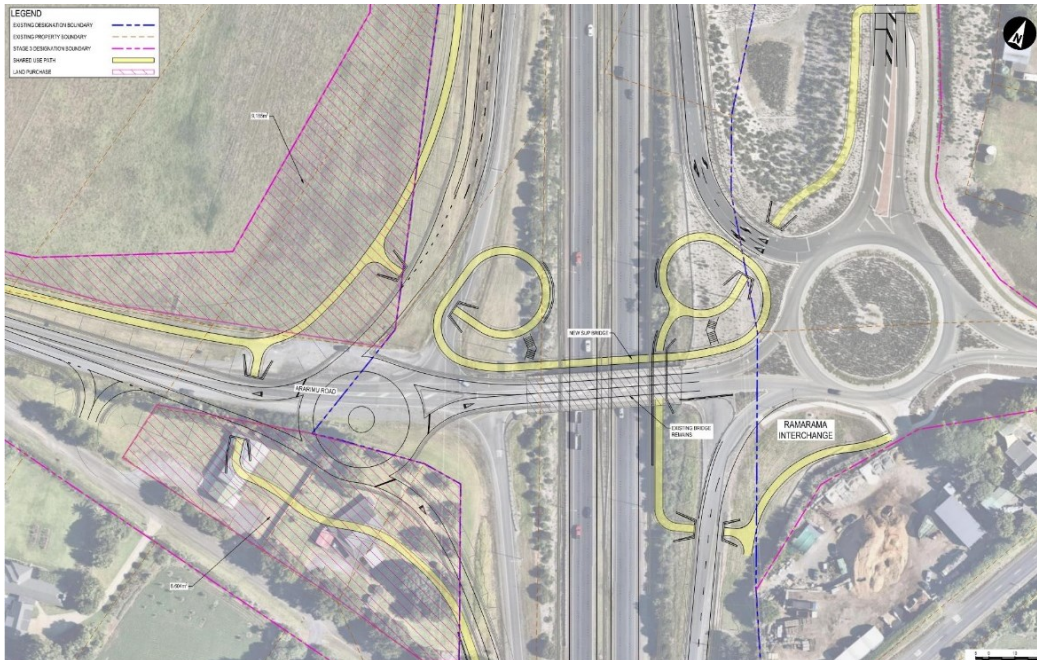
Ramarama Interchange: Option One General Arrangement Plan
